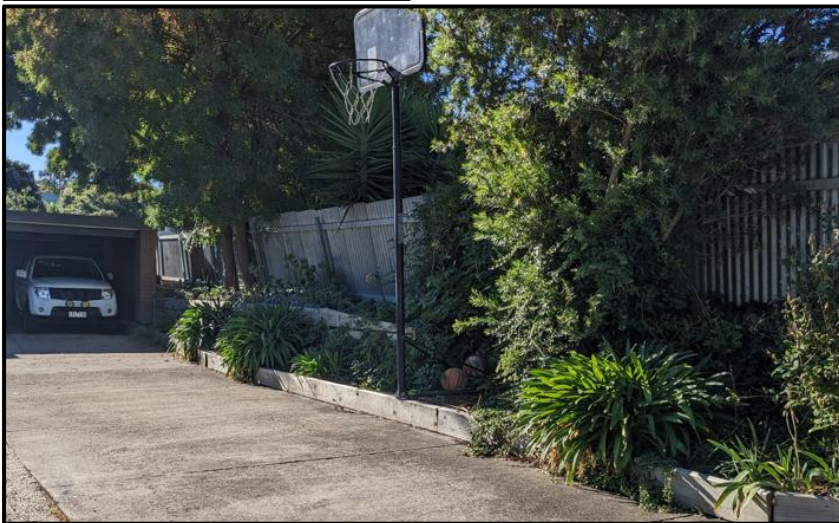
Photo showing the existing retaining wall on the north-eastern boundary (adjoining number 70).
